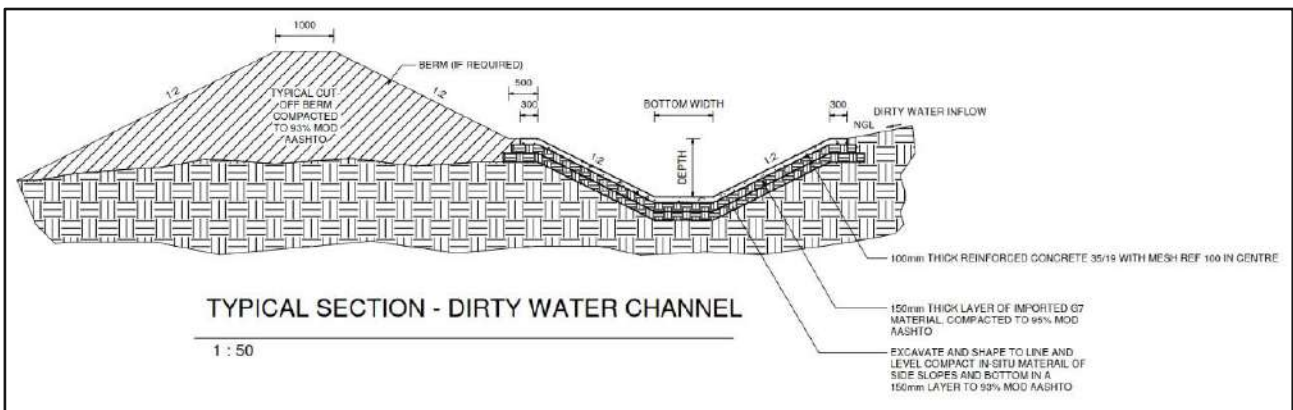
Typical Channel / Berm Cross Section For polluted (dirty) water diversion
